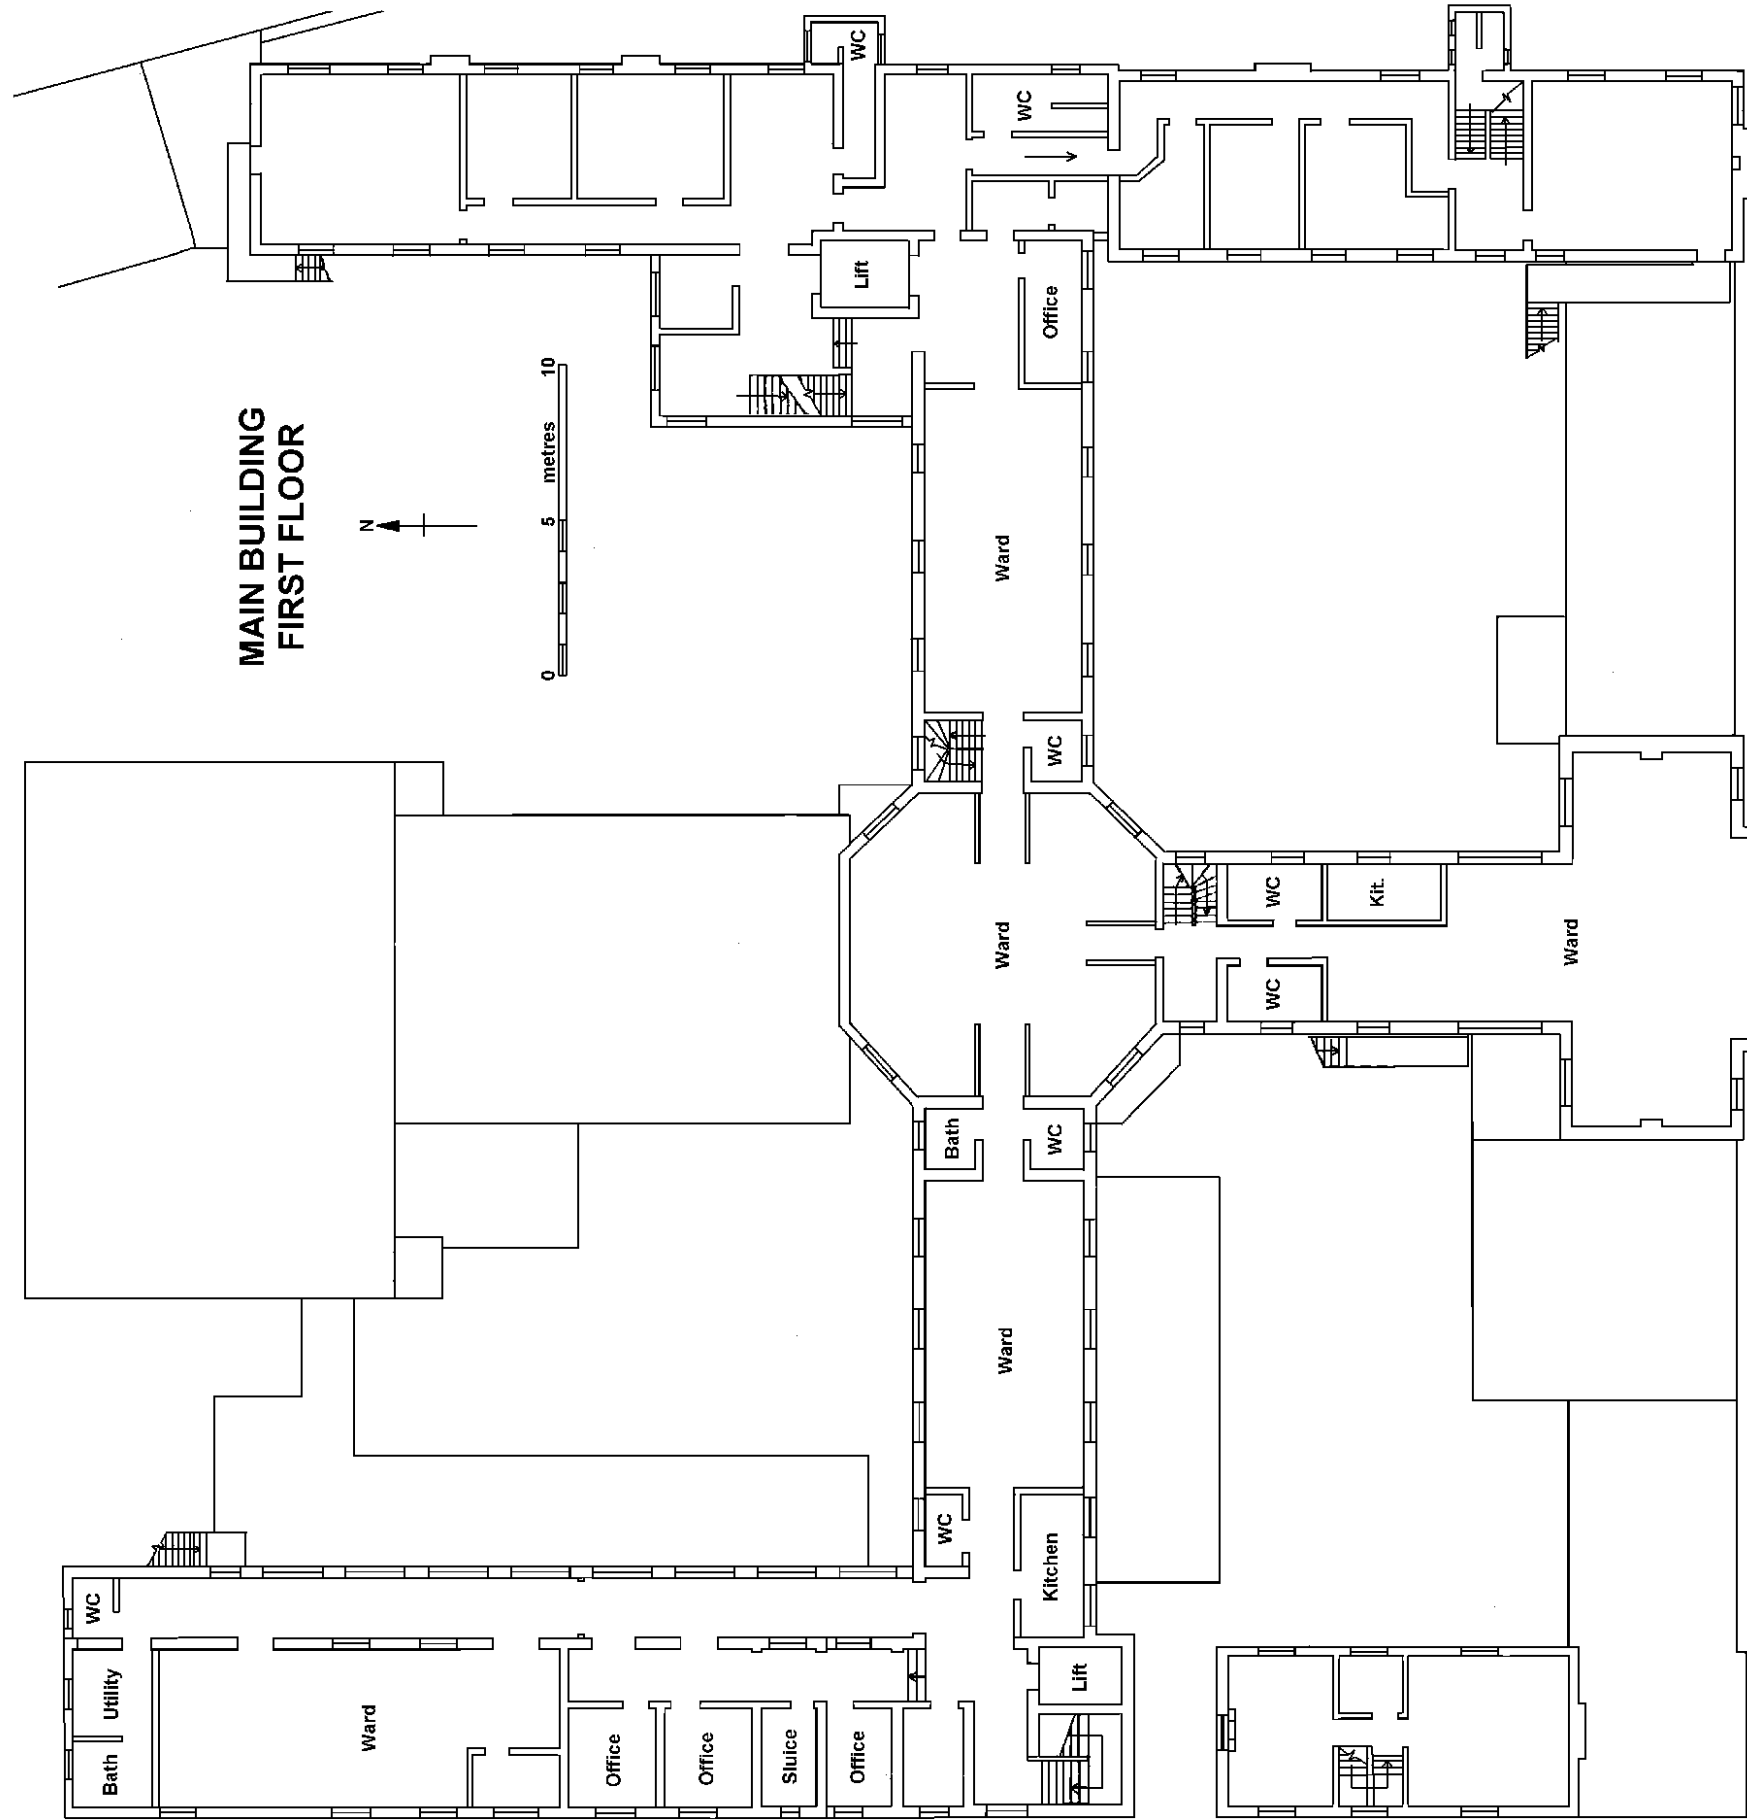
Main building [01], [12], [13], [14], [15], first floor
